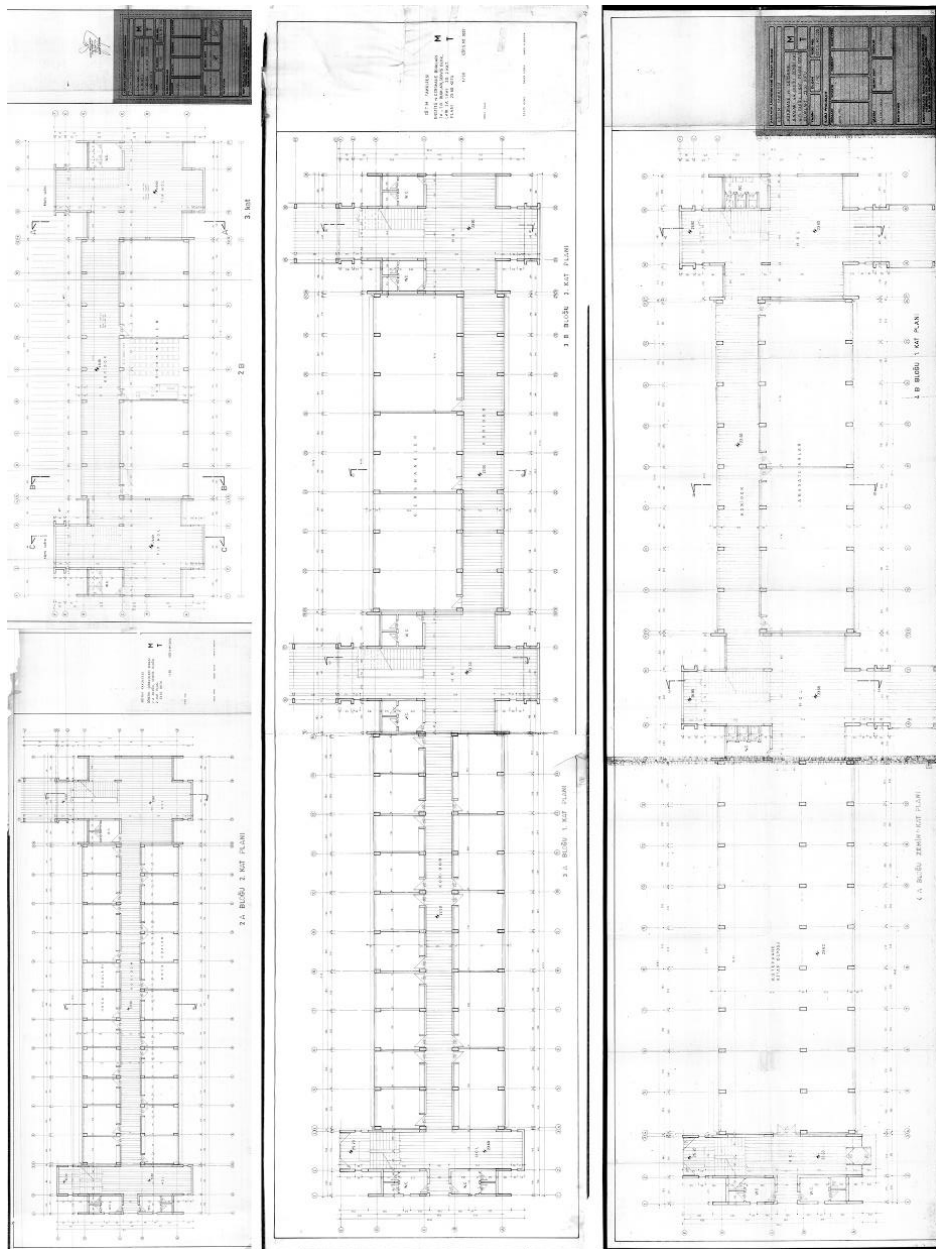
Original plans of the second floor of the Block 2A, the third floor plan of the Block 2B, the first floor plan of the 3A Block, the second floor plan of the Block 3B, the ground floor plan of the Block 4A and the first floor plan of the Block 4B in the Faculty of Educational Sciences (archive of Ankara University Directorate of Construction and Technical Works)
